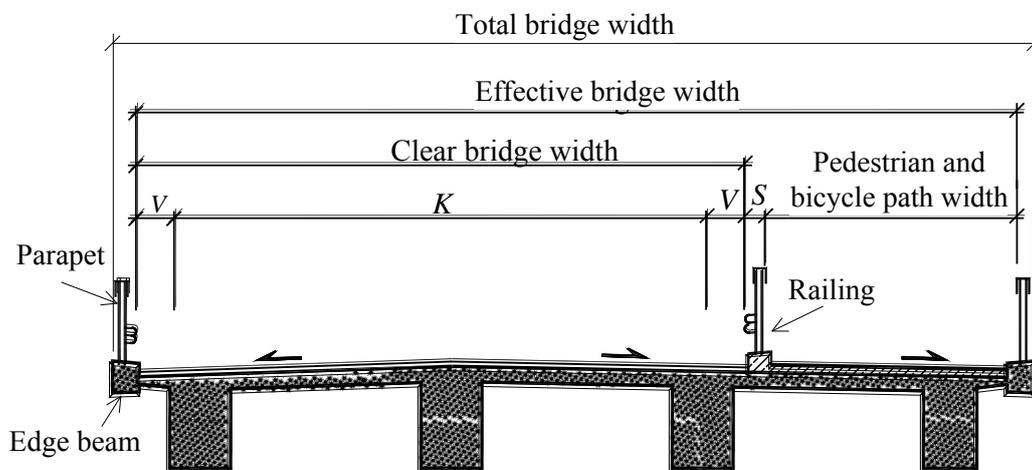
Notations and measures in cross direction of typical beam girder bridge carrying a roadway and a pedestrian and bicycle path.
